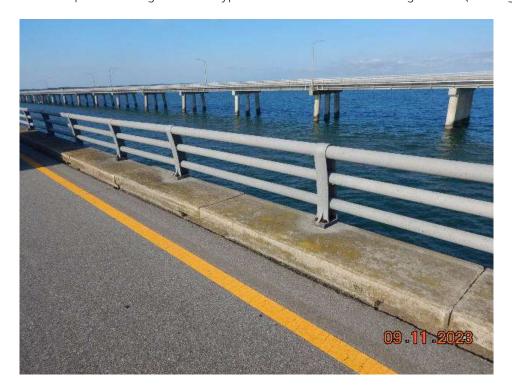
ANB141 Concrete Curb & Metal Bridge Railing – Typical Good Condition of Curb & Railing (Looking Southwest)
